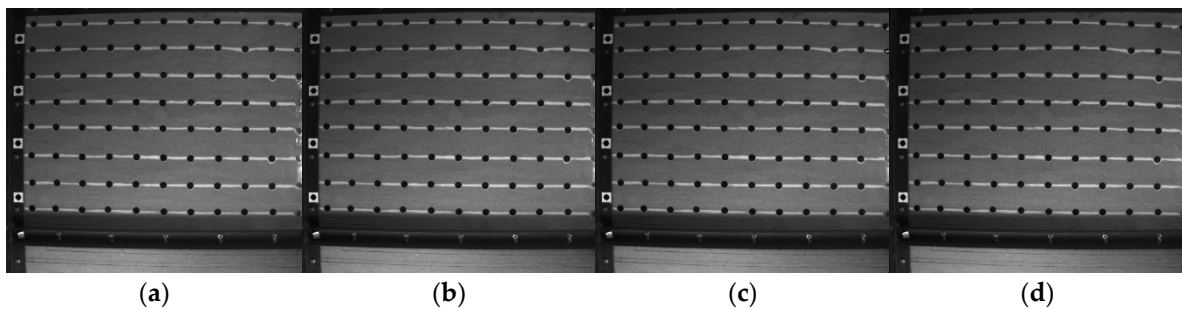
Side face photos of R2 for different excavation depths: (a) Excavation depth of 50 cm; (b) Excavation depth of 60 cm; (c) Excavation depth of 70 cm; (d) Excavation depth of 80 cm.
